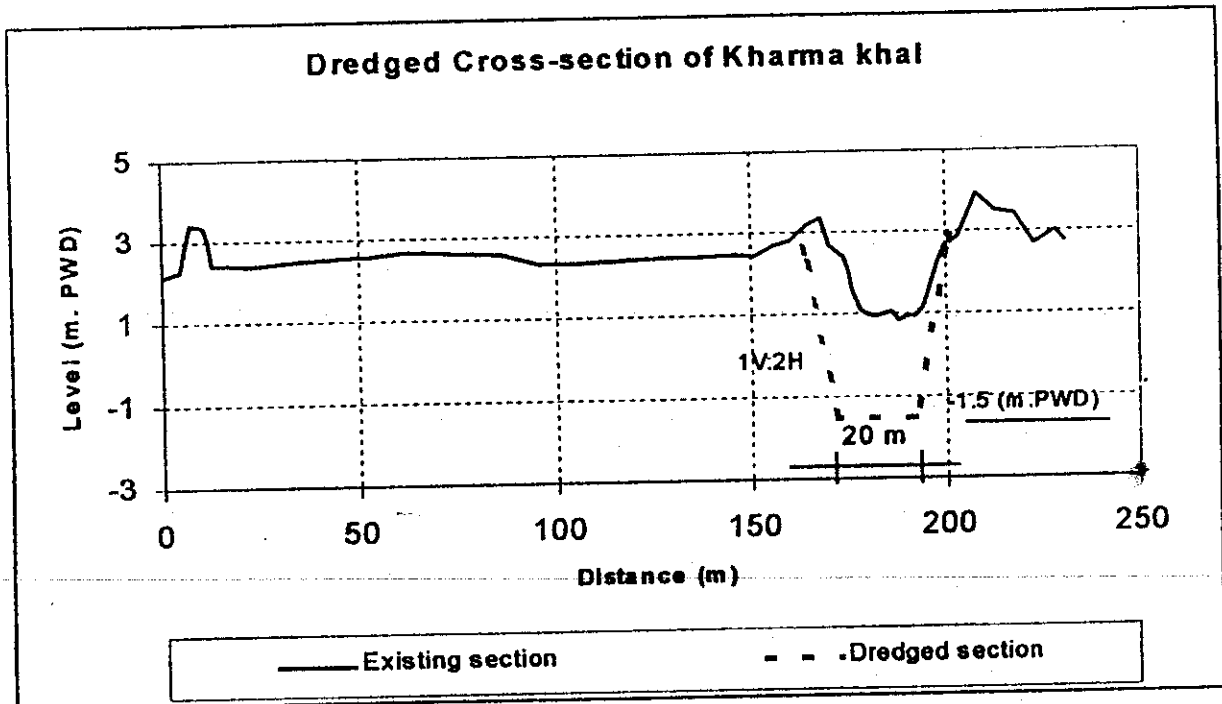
Existing and dredged section of Kharma khal (upstream of Bhola River)
